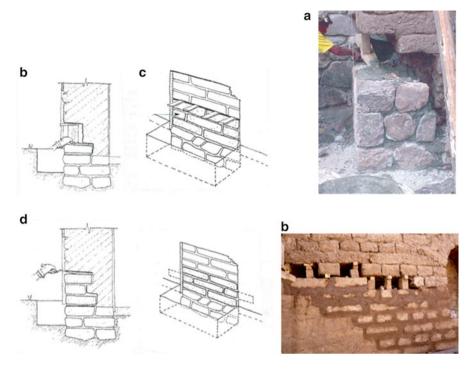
Repair of earth block walls [75, 85]. (a) Repair of stem wall/wall base using natural stone and earth blocks, (b) removal of the weathered earth block masonry to depth of structurally stable section, bracing of cavity, (c) course-by-course filling with fully bedded masonry, allowing joint mortar to dry sufficiently, and (d) forming a friction connection, packing mortar using a pointing trowel
